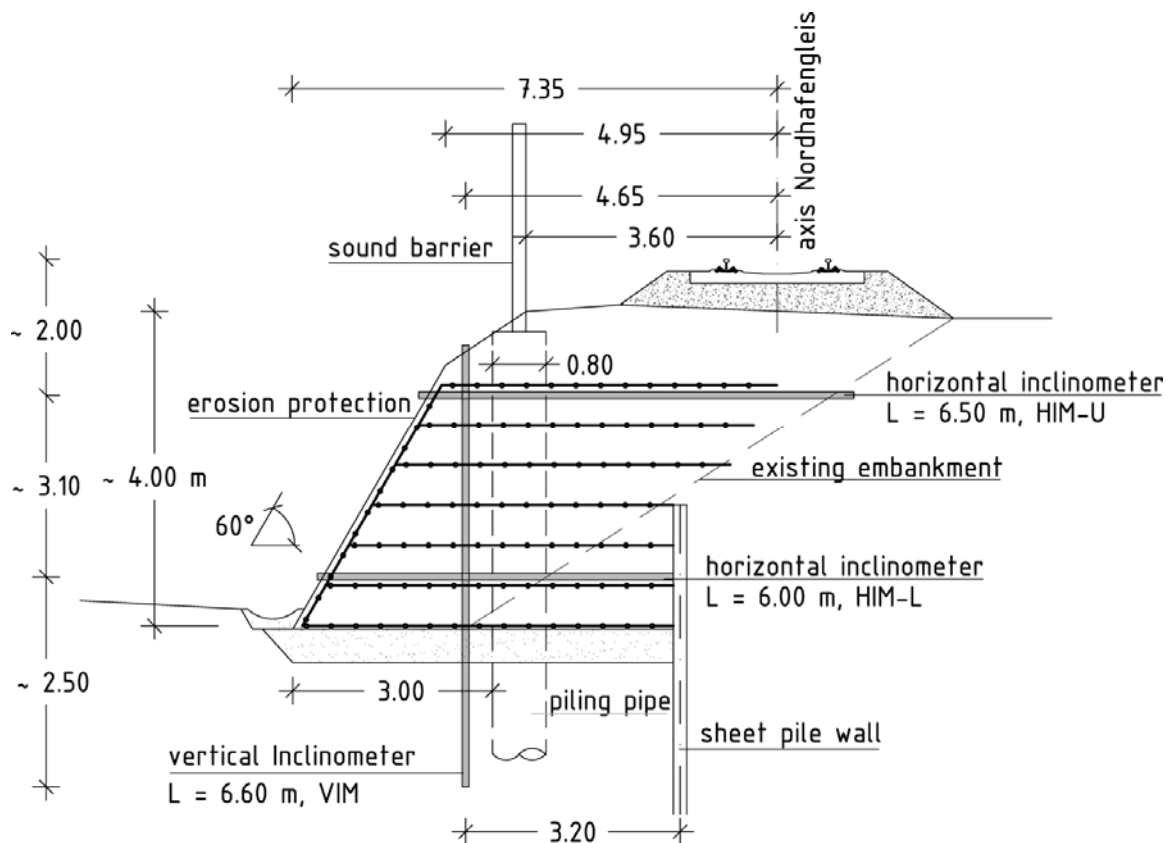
Nordhafengleis Hanover-Ledeburg, Typical cross-section measuring profile
